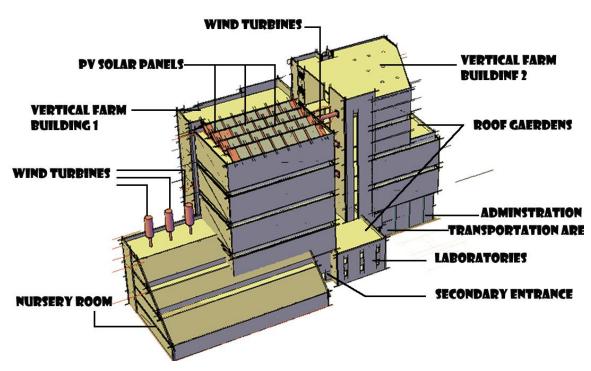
Perspective sketch showing the development of building design in the second phase
